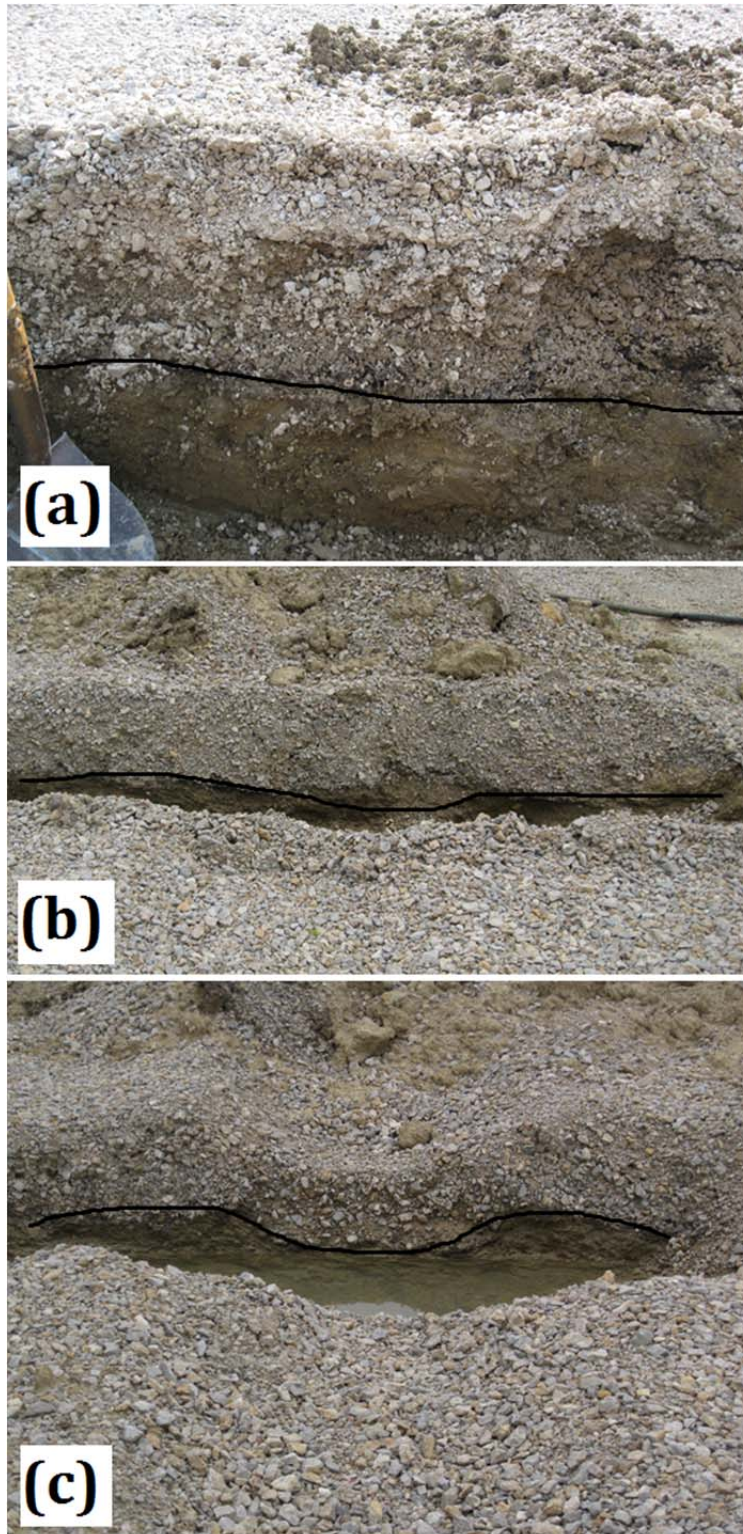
Excavated trench photos showing surface and base-subgrade interface deformations in test sections (a) 1, (b) 2, and (c) 3 for Cell 2 due to loading under flooded conditions
